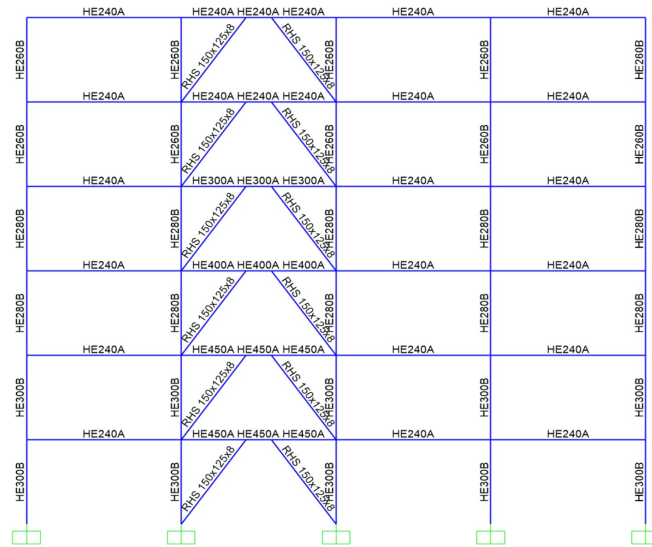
Six-storey four-span planar steel Dual Eccentrically-braced Frame studied. Sections used for beams, links, braces and columns
